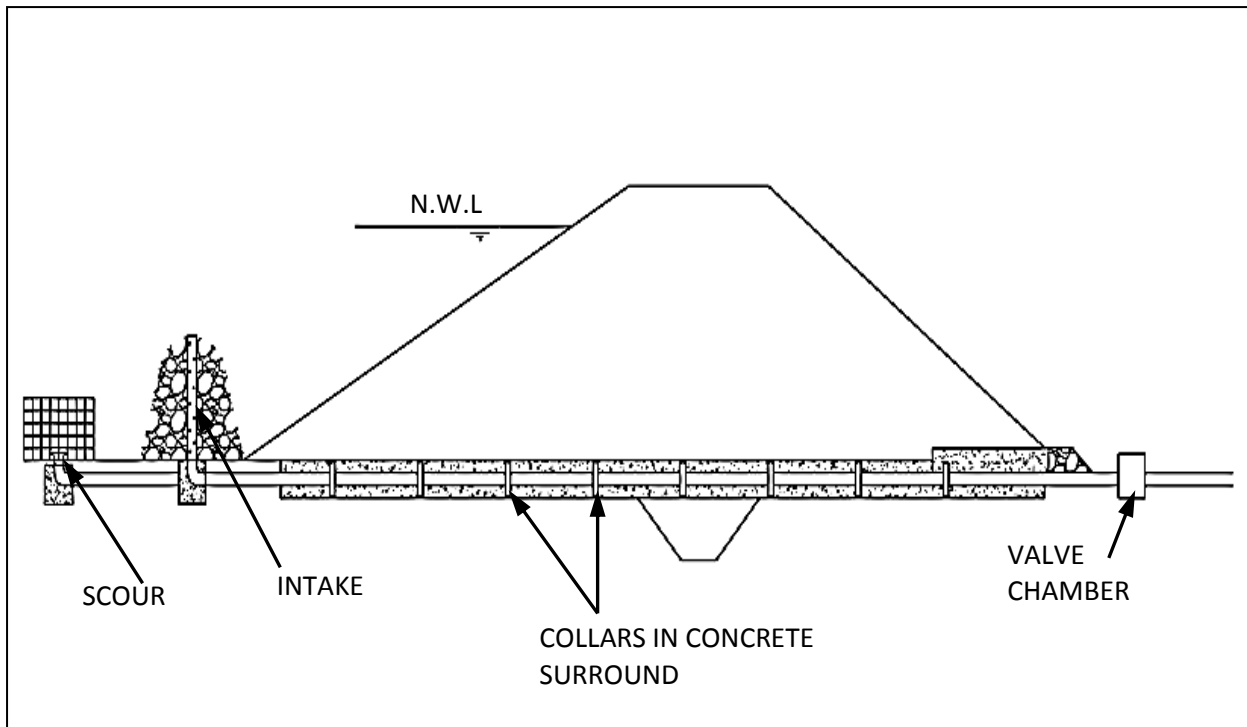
Typical Outlet Works for a Small Earth Dam
